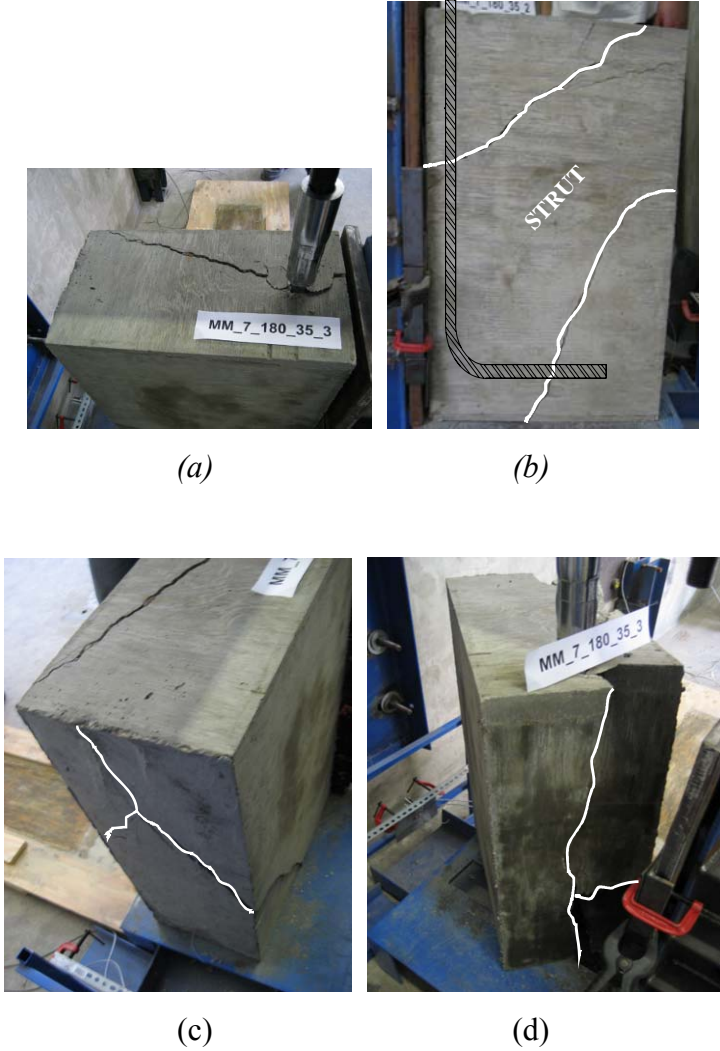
Photo of typical crack pattern after concrete splitting failure (a) top, (b) side, (c) rear, and (d) front faces. (MM\_7\_180\_35\_3)
